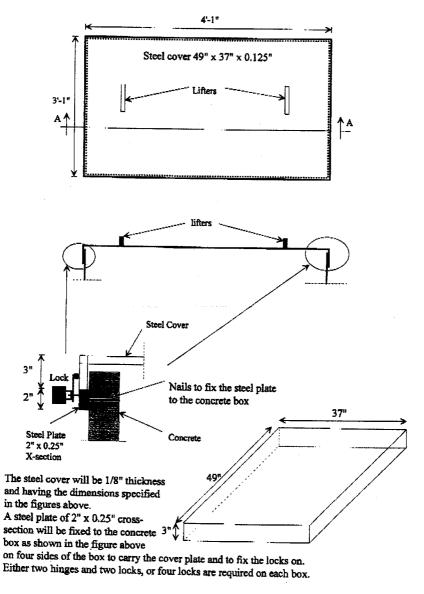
(continued) Details of the steel cover for the concrete box 11600-8
